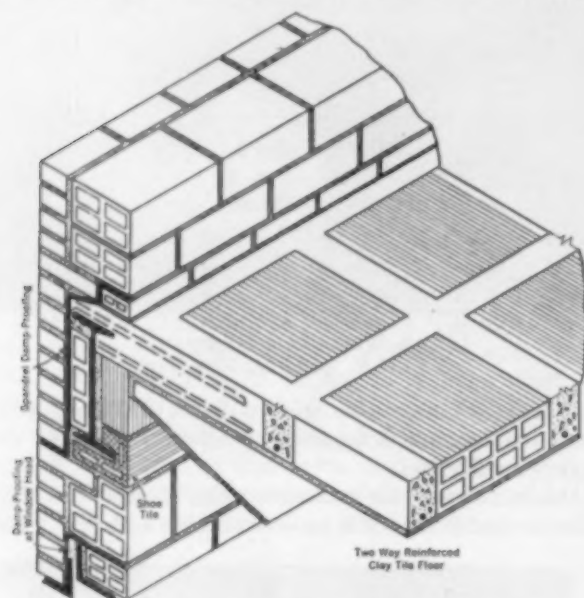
HOLLOW TILE WALL FACED WITH BRICK
